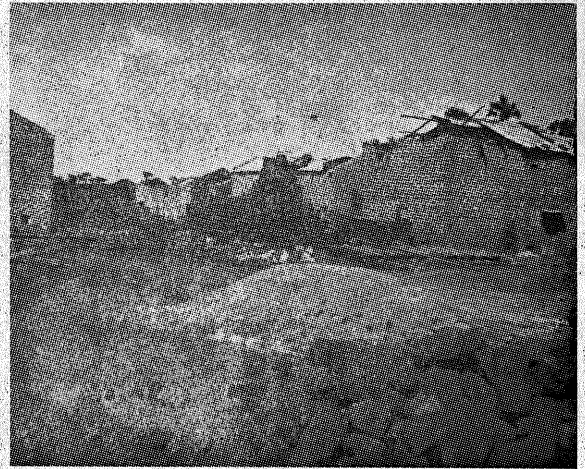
Tobacco barns in Gauravaram village with walls damaged and roofs blown off
